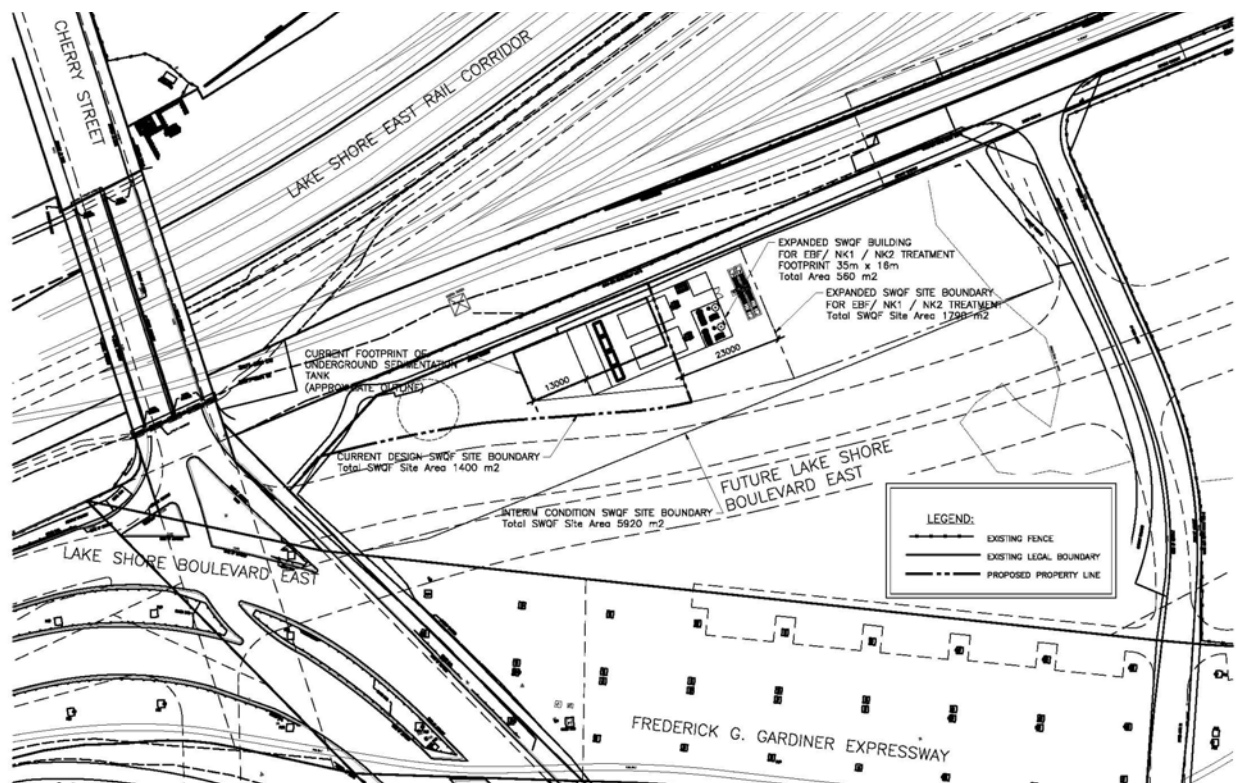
Conceptual Site Plan Showing Expansion of the Stormwater Quality Facility at 480 Lake Shore Boulevard
